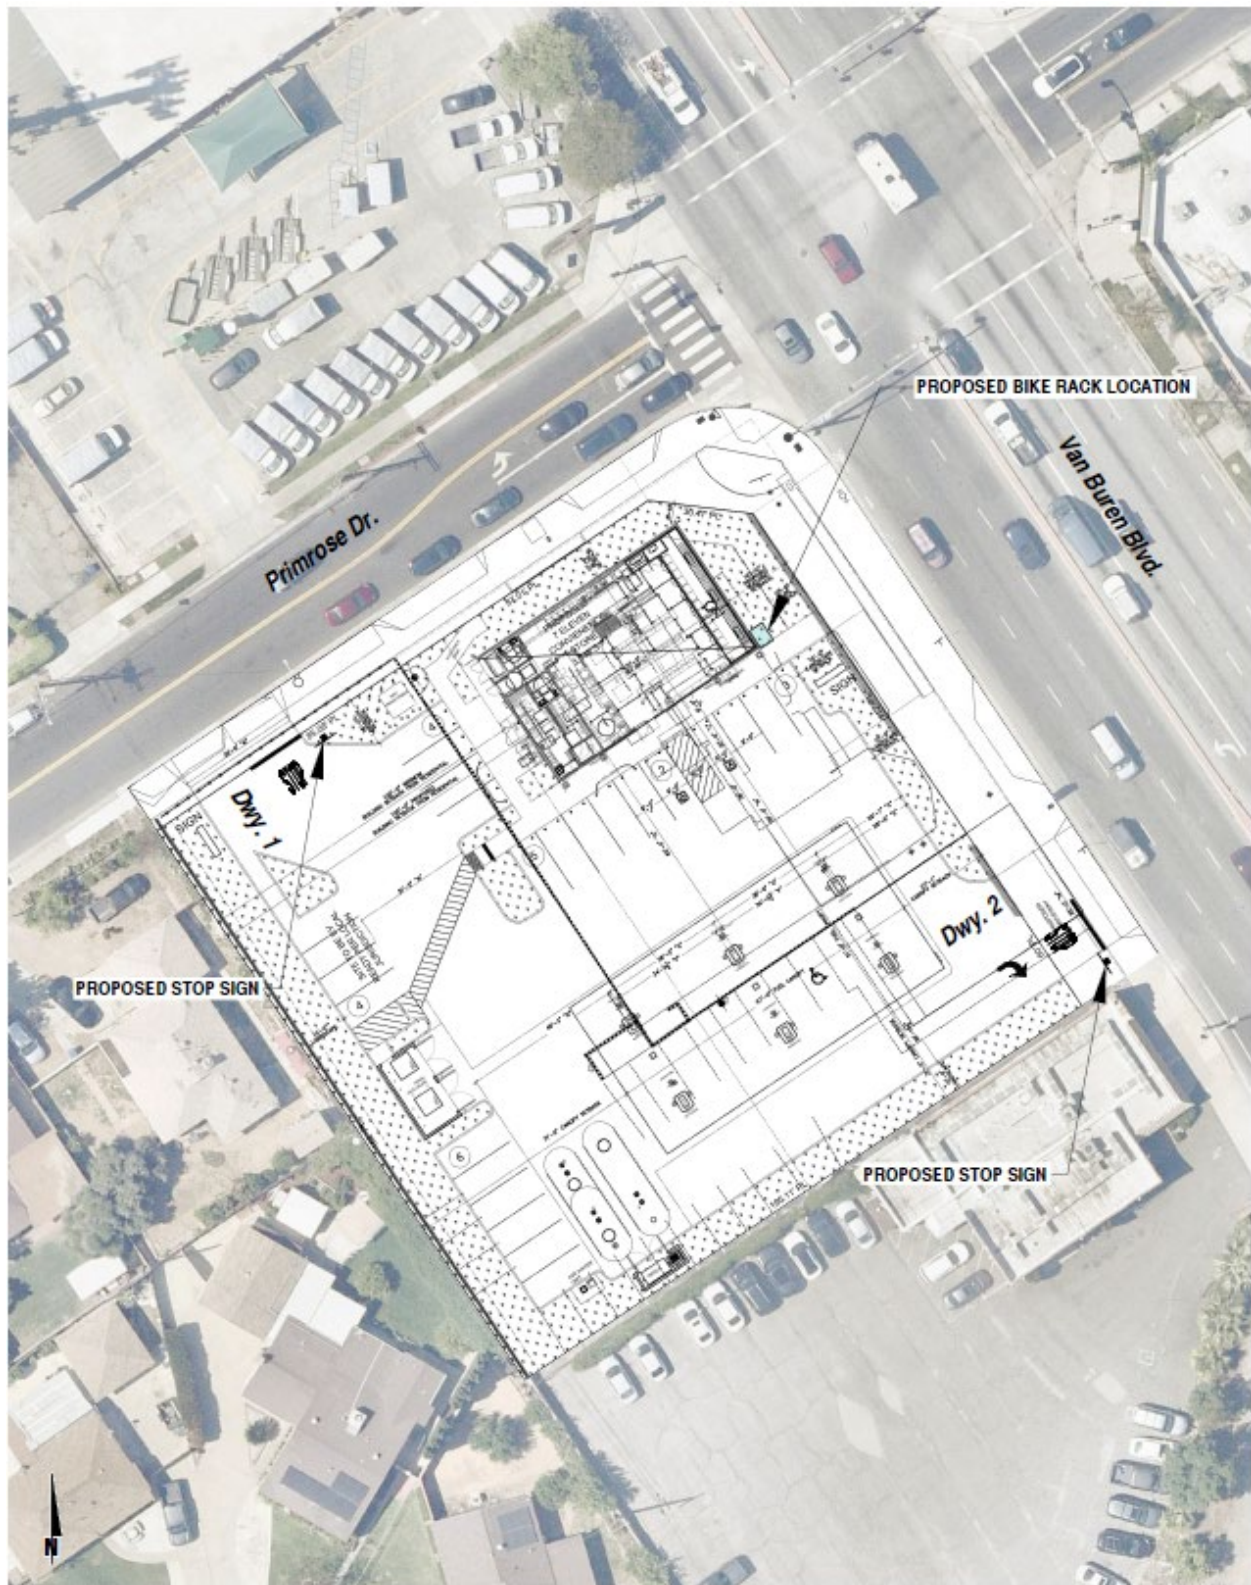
PRELIMINARY SITE PLAN
